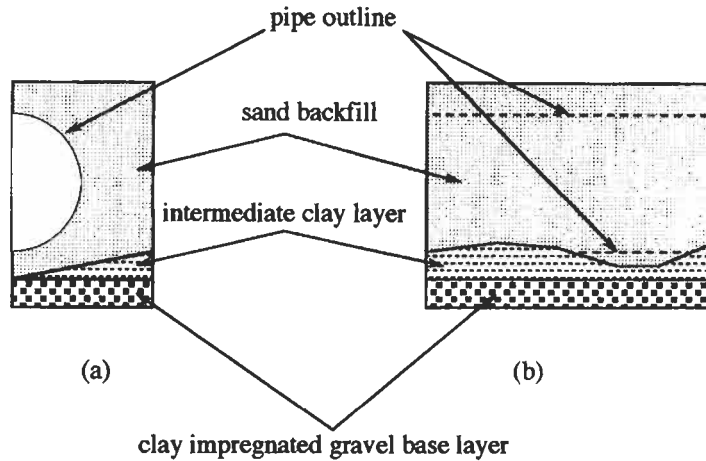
Schematic of visual observations in test excavation: (a) cross-section, (b) longitudinal section.
